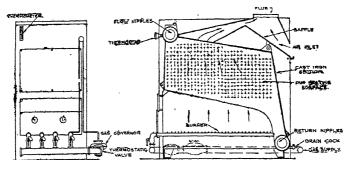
Cast-Iron Sectional Gas Boiler ('Ideal').
